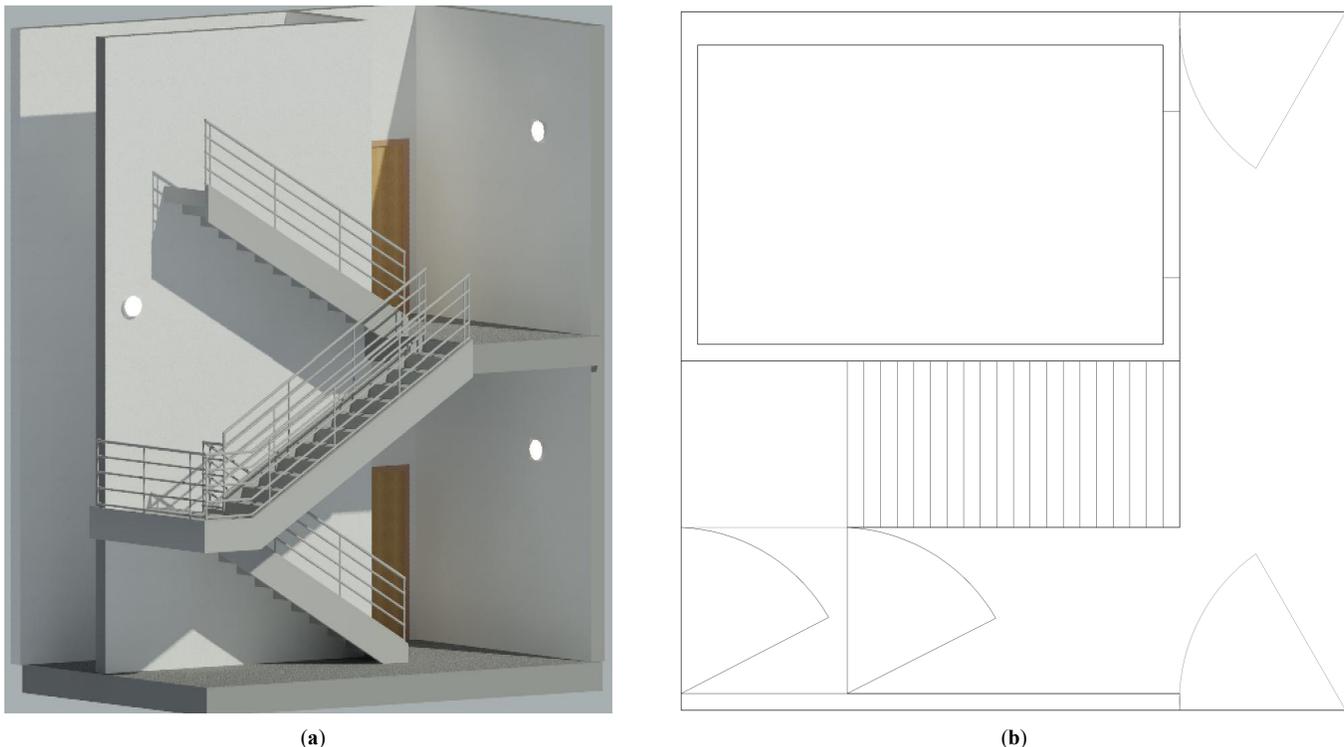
(a) Visual image of a typical stairwell and (b) the first floor stairwells plan.
